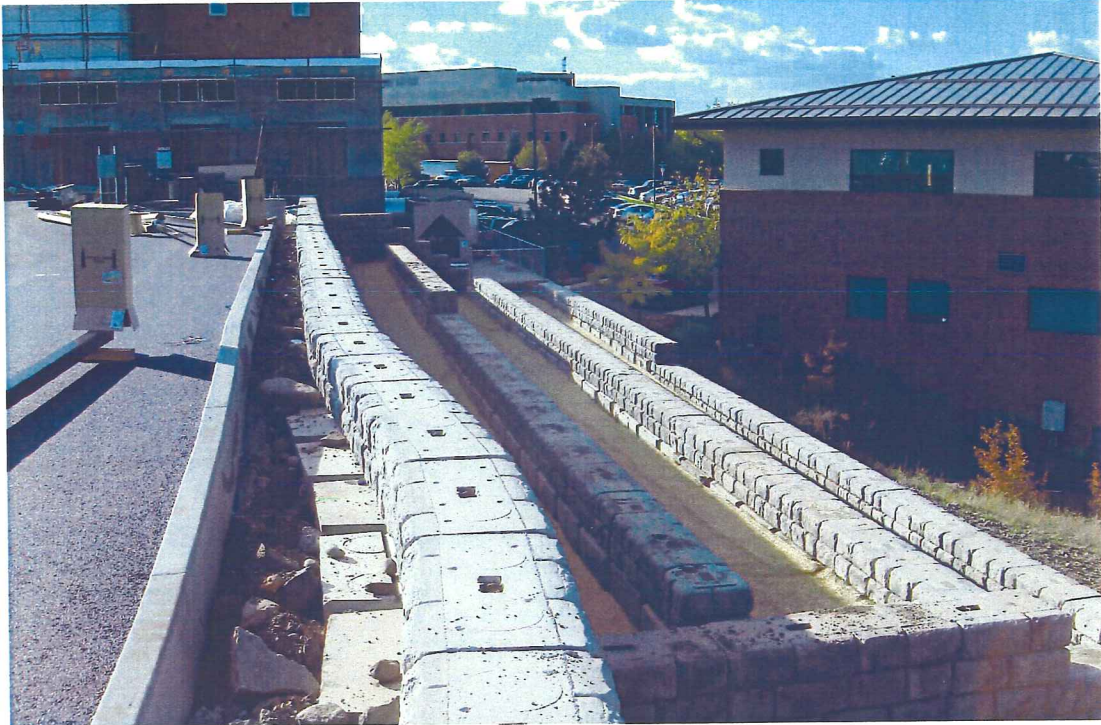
View to west of imported soil fill used to raise eastern parking area elevation.
